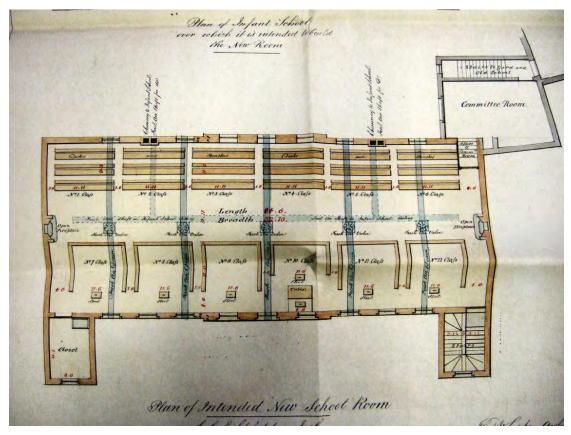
Plan showing new room of school (Site 20), which would form the first floor over what was the original single storey infants' school (PRO SP 246)
